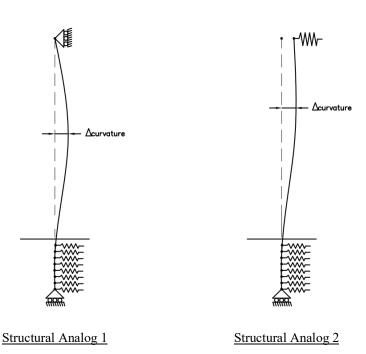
Structural Analogs for a Typical Post Frame Column
